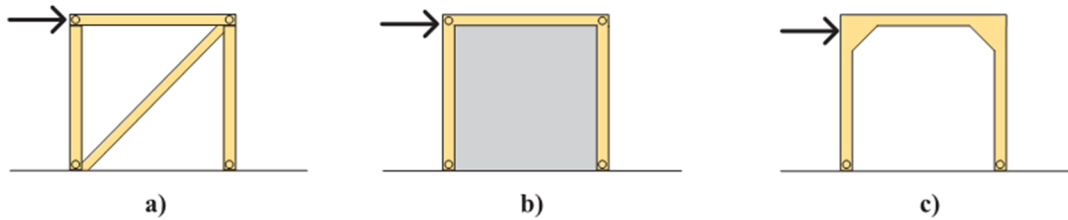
Different ways to stable a structure. a) diagonal bracing; b) shear wall; c) rigid joints (Swedish Wood, 2015).
